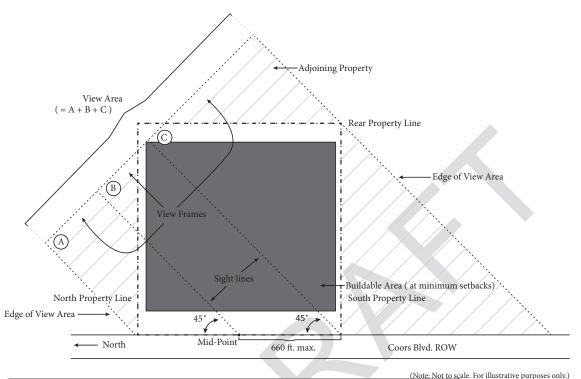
View Frames and View Area for Buildable Area – Plan View
